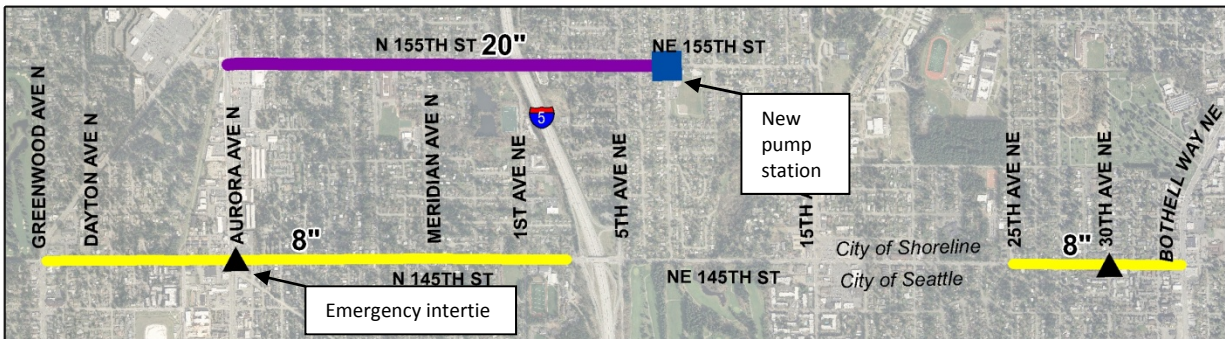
New Mains, Connections and Pump Station, Alternative B5
